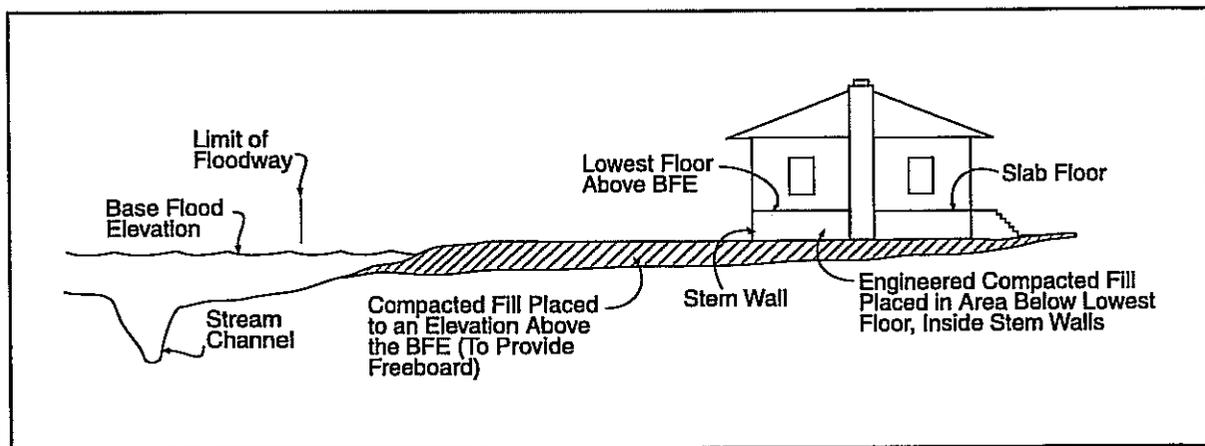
Structure on a stem wall foundation. The lowest floor is raised above the BFE. The space enclosed by the stem walls is filled with engineered compacted fill.
